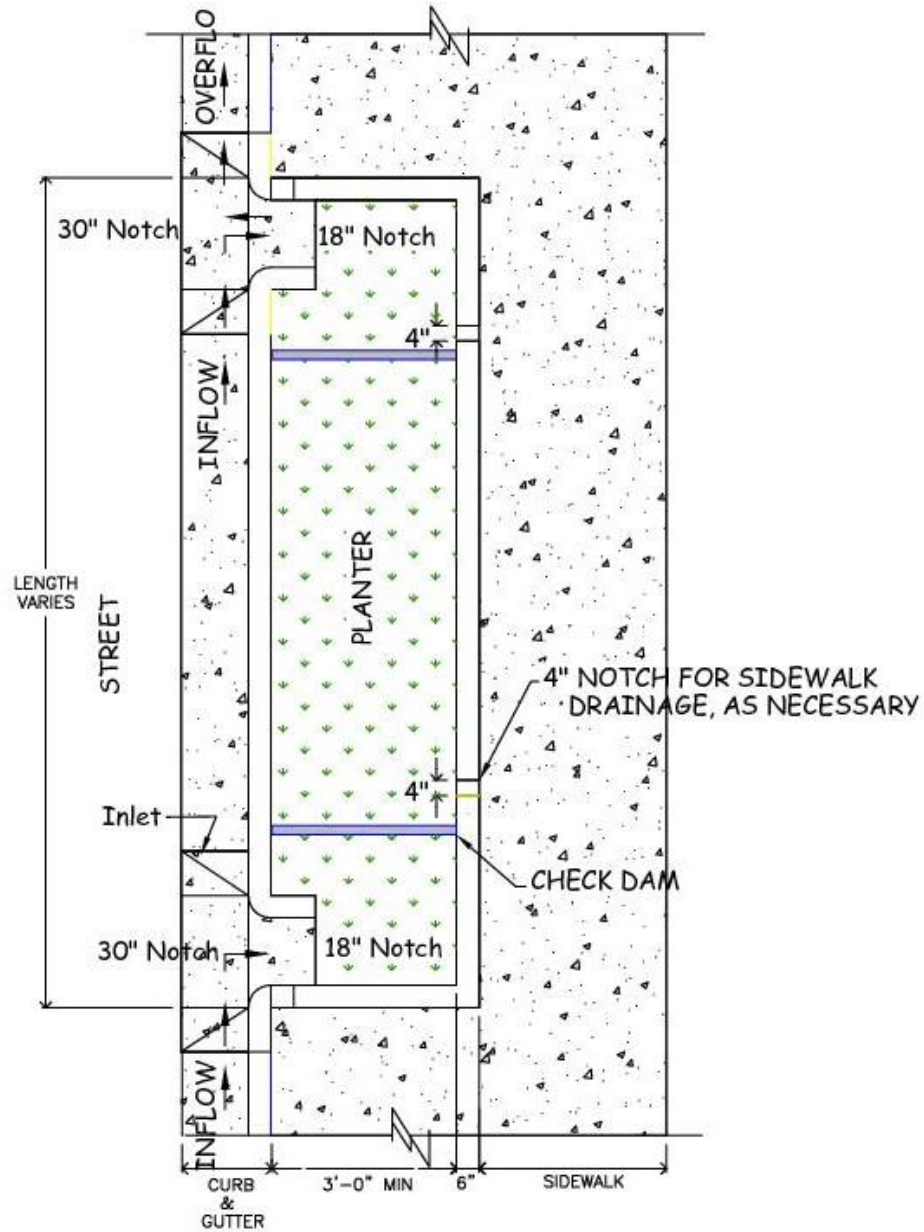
Plan view of LISD Planter System (Trinkaus Engineering, LLC - 2017)
